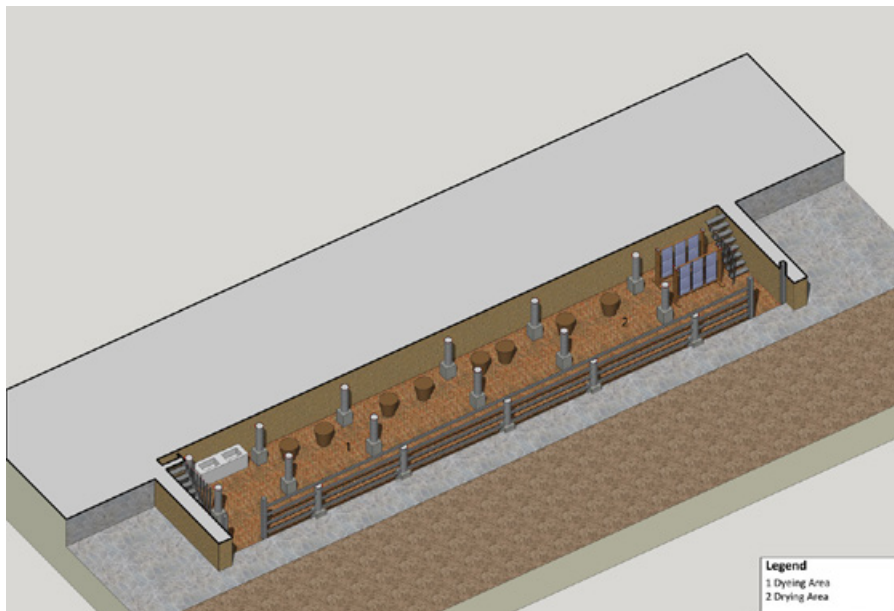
Ground floor of the embroidery workshop. (Source: Author)
